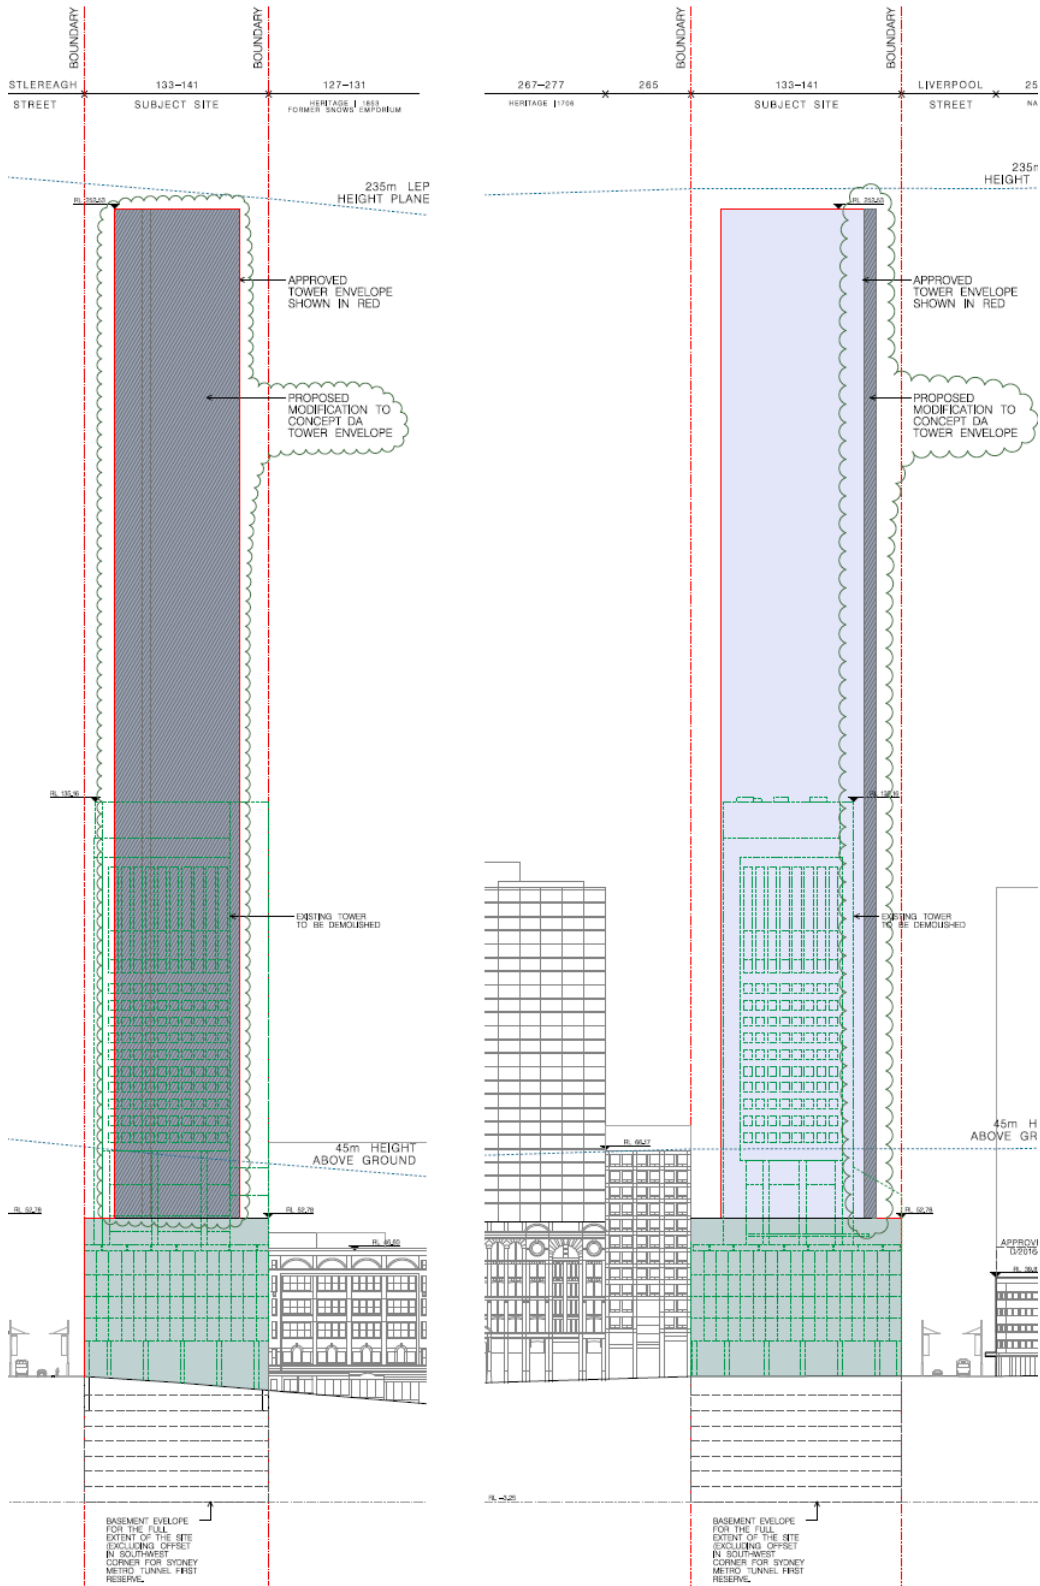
Proposed Liverpool Street (north) elevation (left) and Castlereagh Street (east) elevation (right), areas to be modified hatched and clouded.
